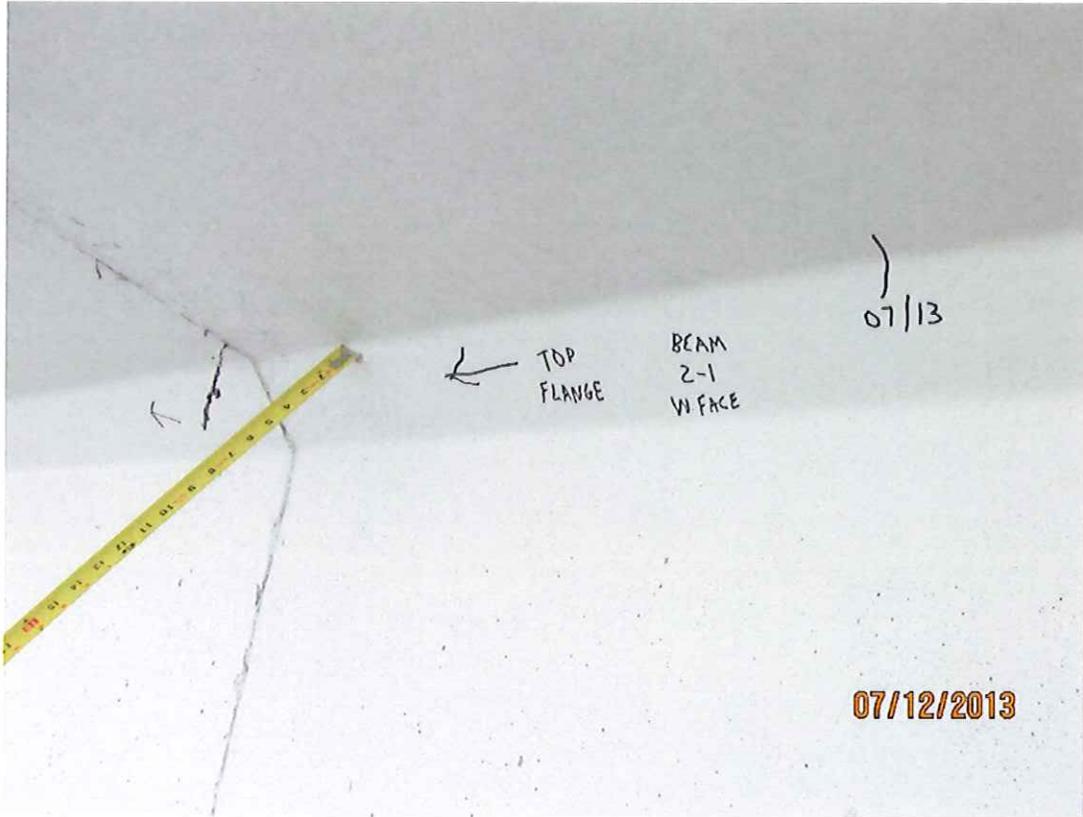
Longitudinal crack in web along top flange juncture
